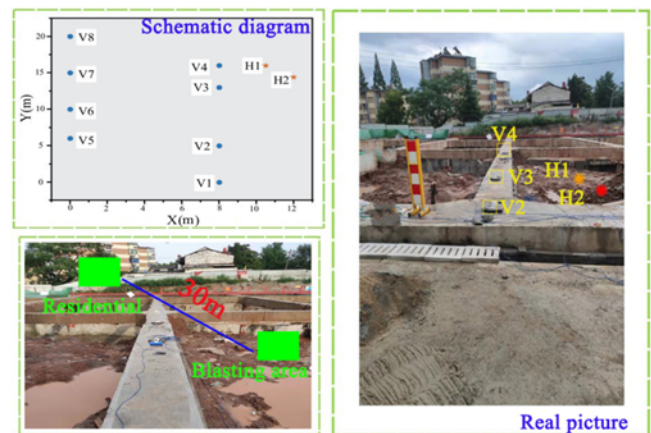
Schematic Diagram of Sensor and Dry Ice Fracturing Tube Layout
